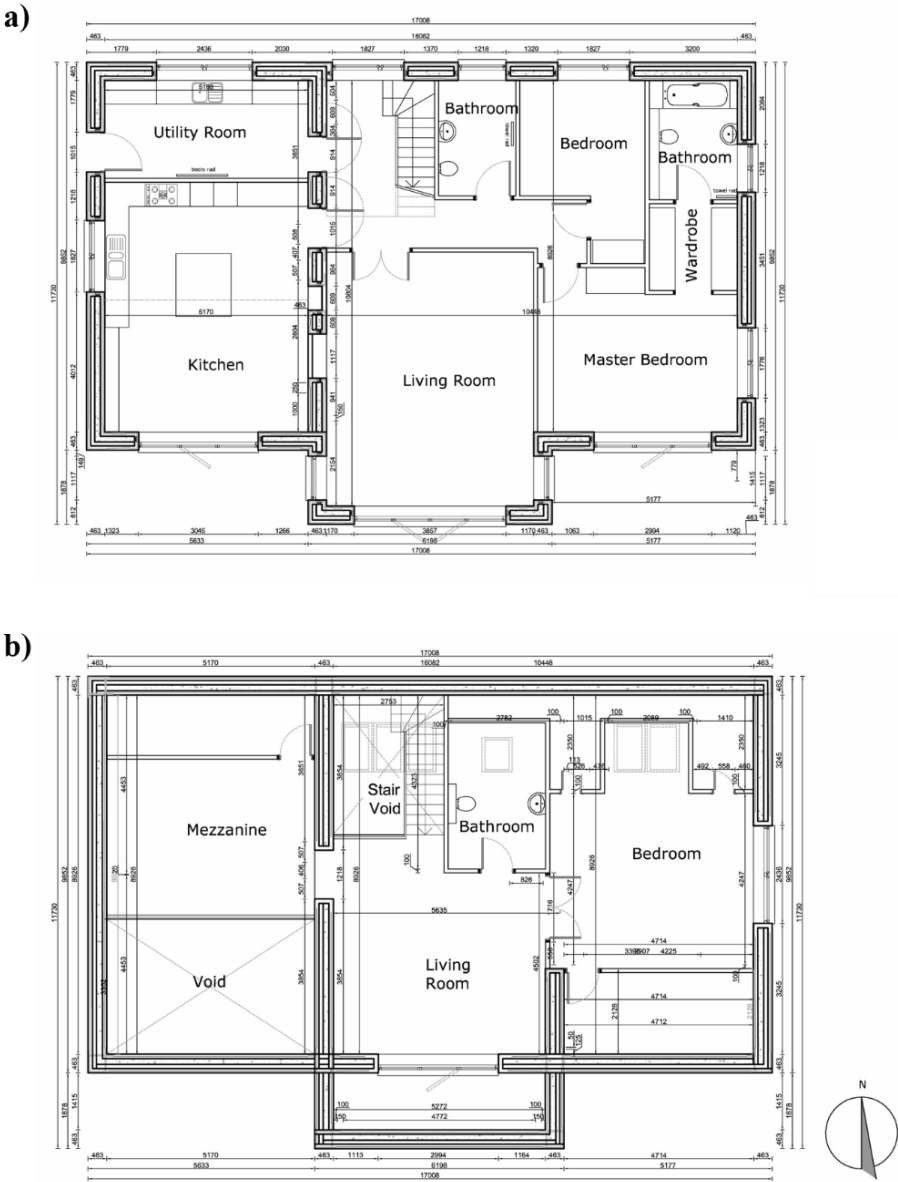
(a) Ground floor and (b) first floor plan of Twiga Lodge
